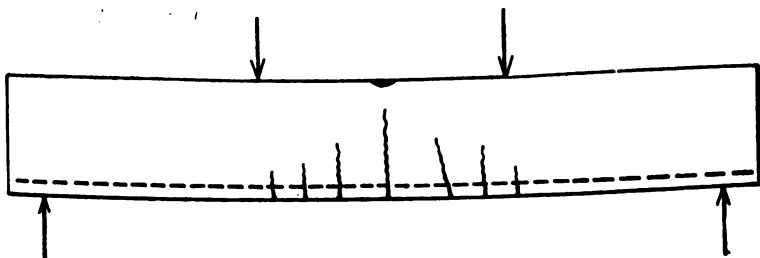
Beam Failure by Tension in Steel.
